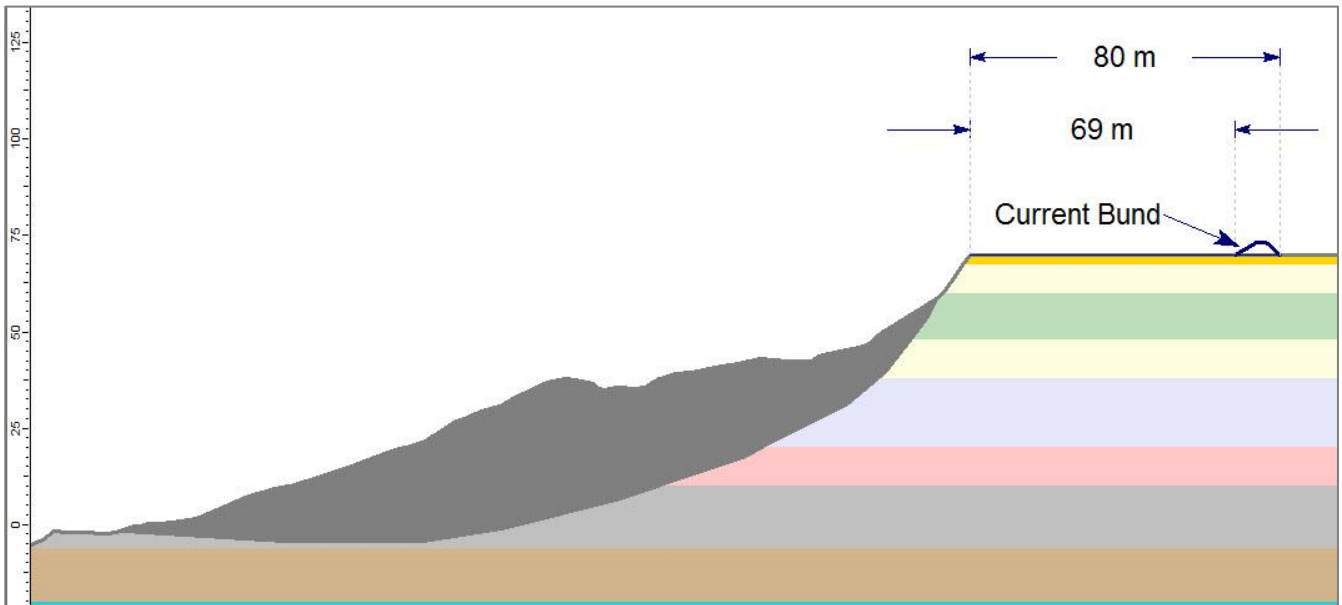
Section Geometry – North Wall Section for Abandonment Bund Assessment
